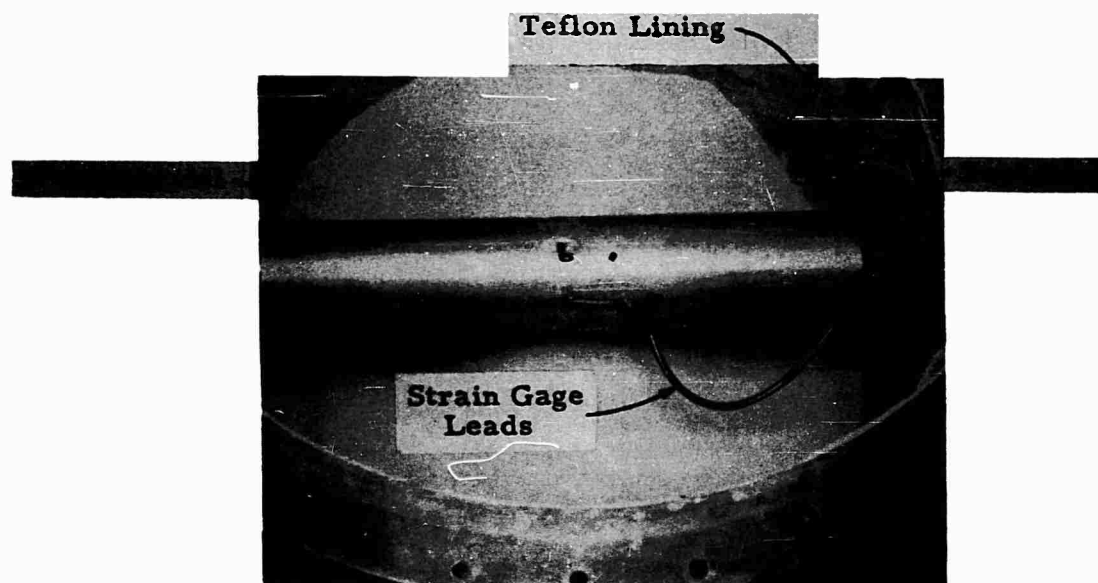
TUNNEL MODEL PRIOR TO SAND PLACEMENT
